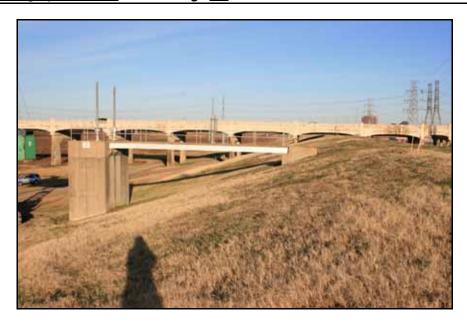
View Northwest of Continental Street Viaduct (behind Woodall Rodgers Pressure Sewer Outlet Gate) Spanning the East Levee
